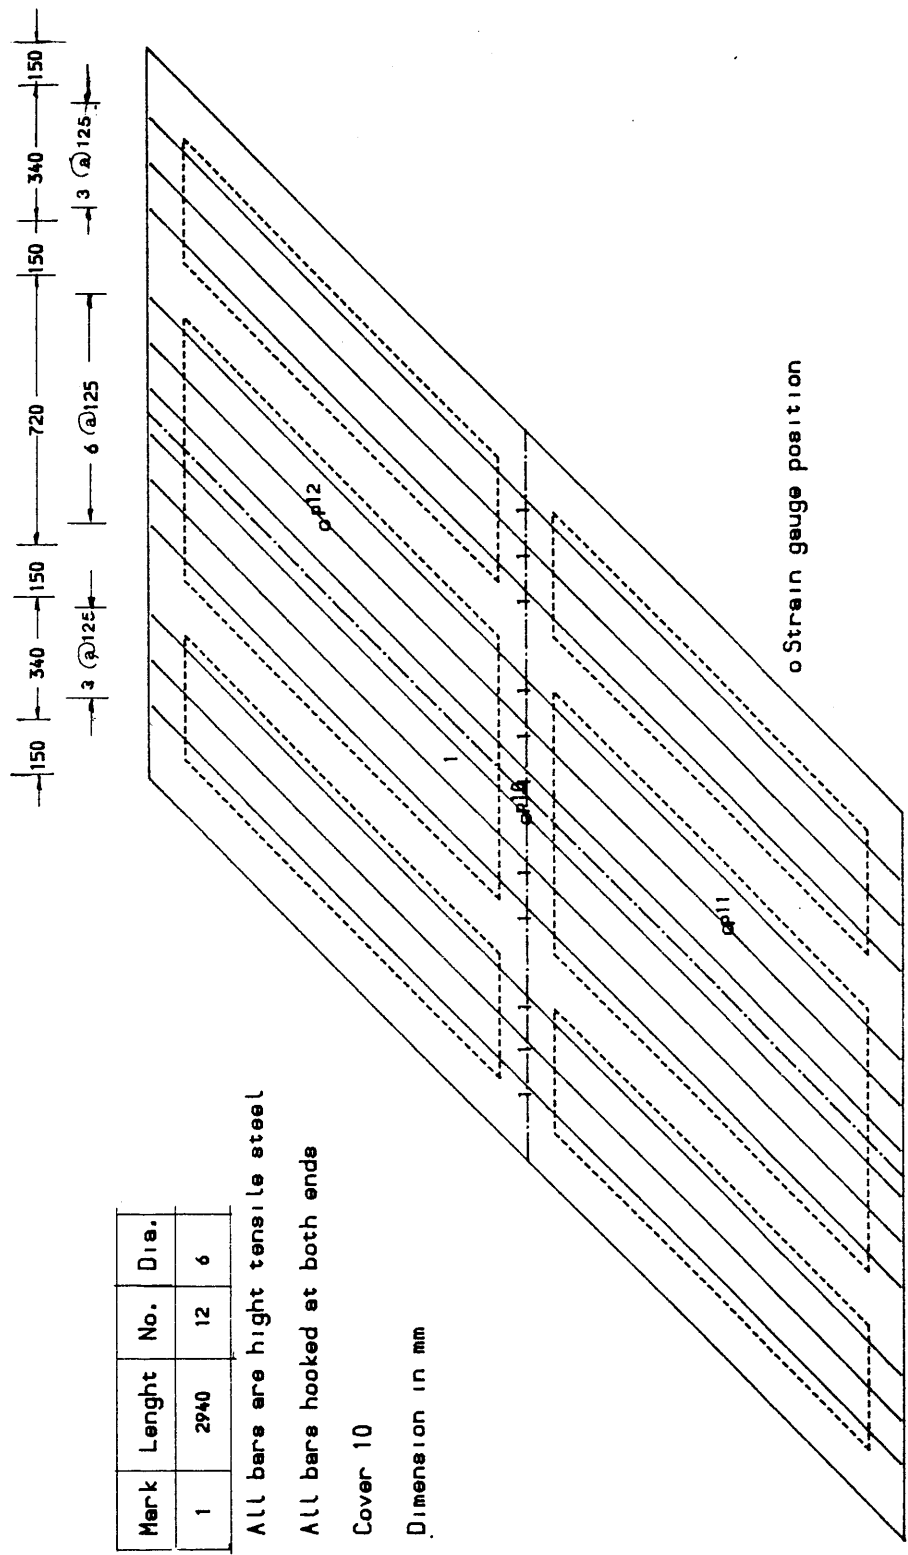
MODEL RIBBED SKEW SLAB NO. (6) Details of bottom longitudinal steel and strain gauges position in the slab
